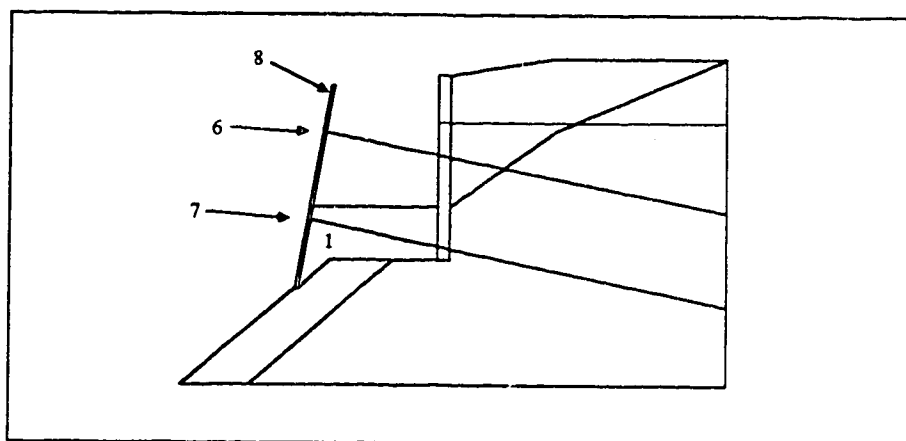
Finite element mesh; cross section at the reference sheet pile wall joint of the east wall.
